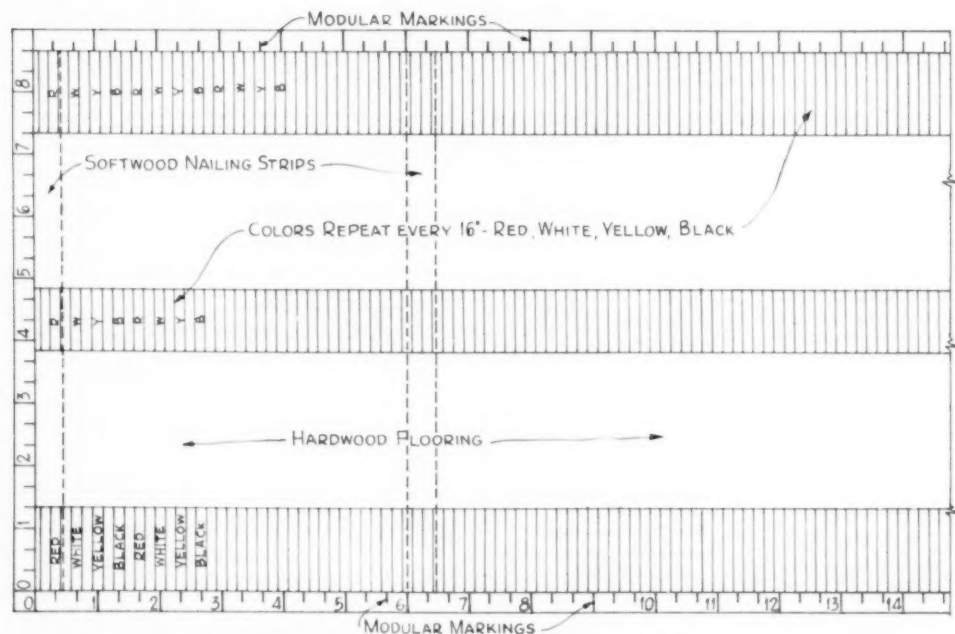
Universal type of modular jig used for fabricating walls, floors, roofs and non-rectangular sections
